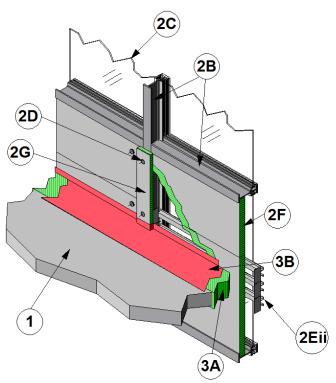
Perimeter Fire Barrier System with Hat Channel Reinforcement
